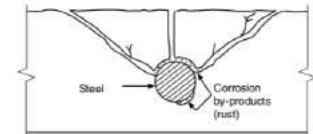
The expansion of corroding steel creates tensile stresses in the concrete, which can cause cracking, delamination, and spalling.
